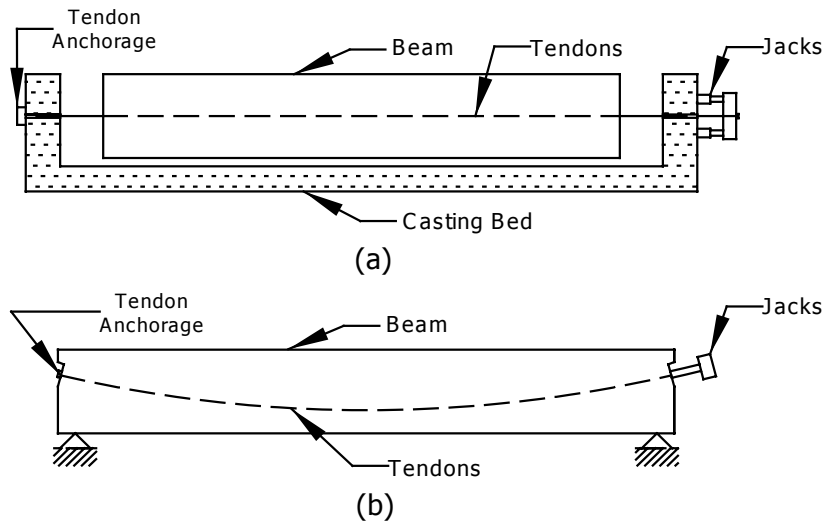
PRESTRESSED CONCRETE BEAMS a) PRE-TENSIONED AND b) POST-TENSIONED
